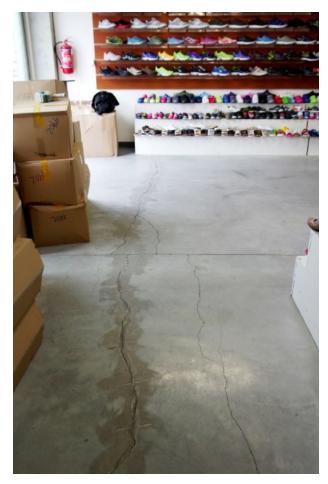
Cracks in the reinforced concrete floor of the hall parallel to the cladding. Perpendicular to the cracks is an expansion joint.
